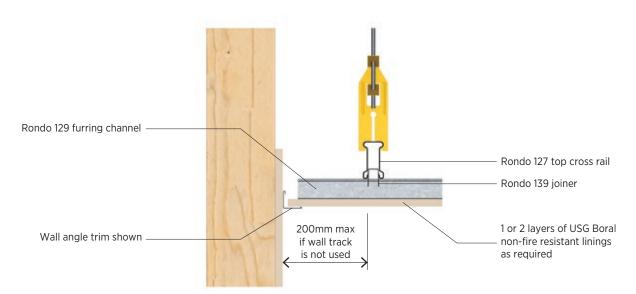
Typical Perimeter Detail – Section Through Top Cross Rail
